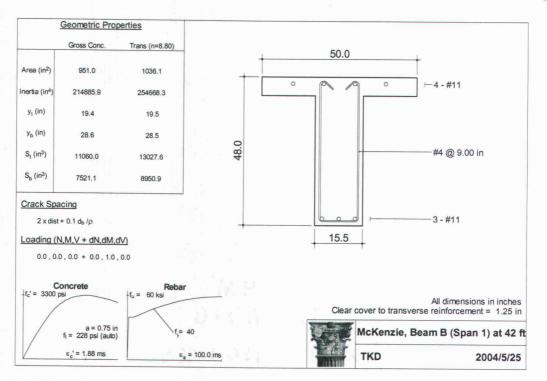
Cross-section for McKenzie River Bridge at 42 ft in span 1 (RESPONS 2000TM).
